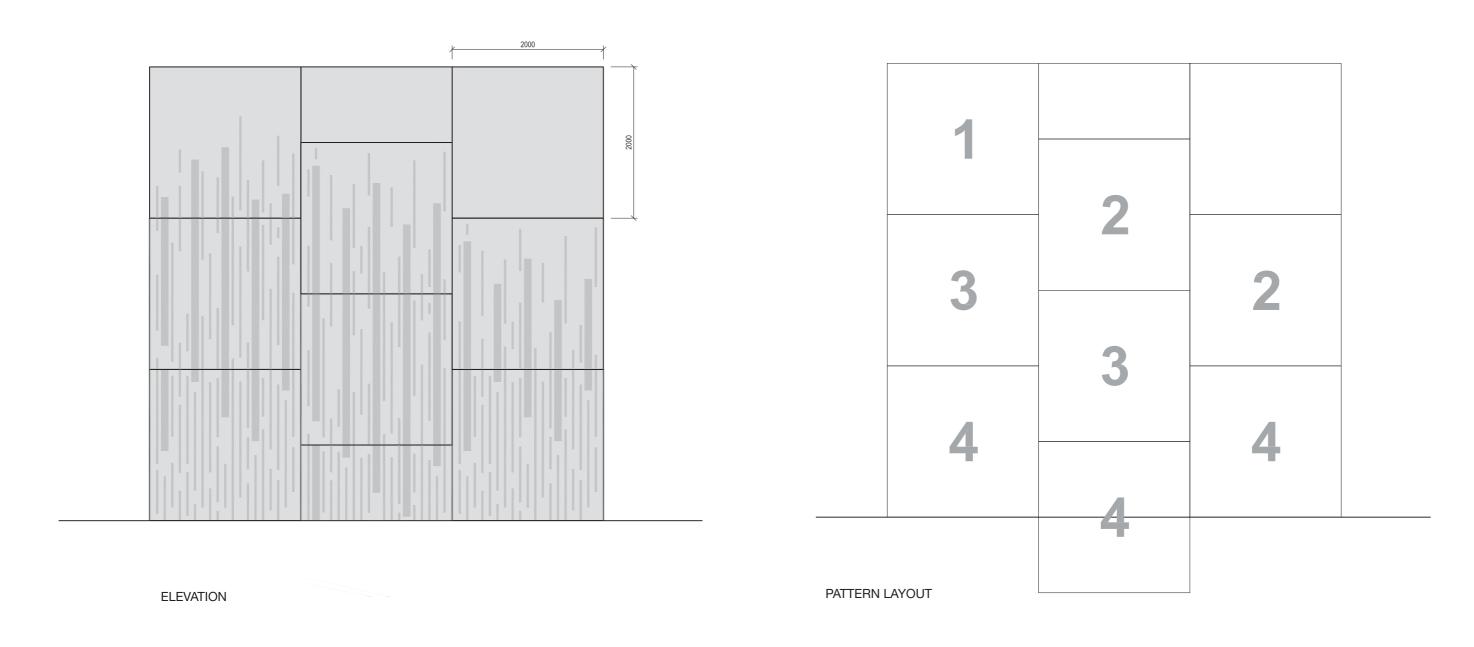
Indicative elevation and pattern layout of a reinforced soil wall using 2m x 2m panels. Panel type 4 would be always at the ground line, with plain panels located in the upper sections of the wall.
